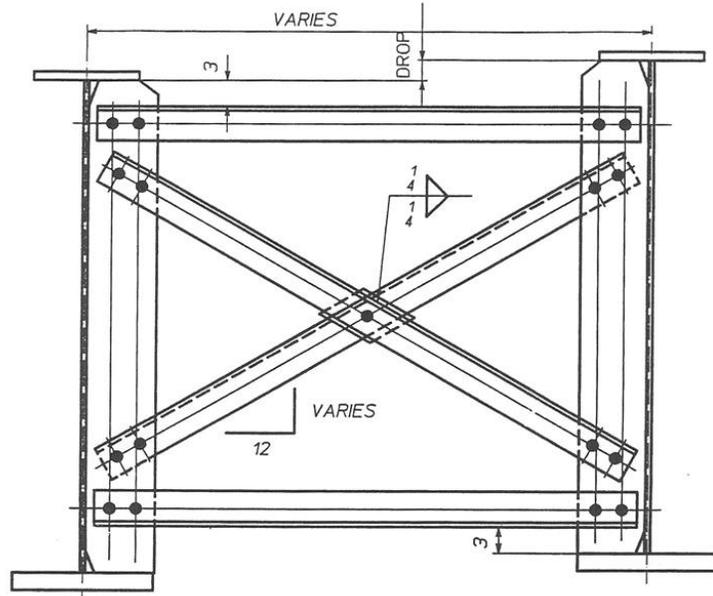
Detail sketch of a typical Knocked-Down cross-frame
